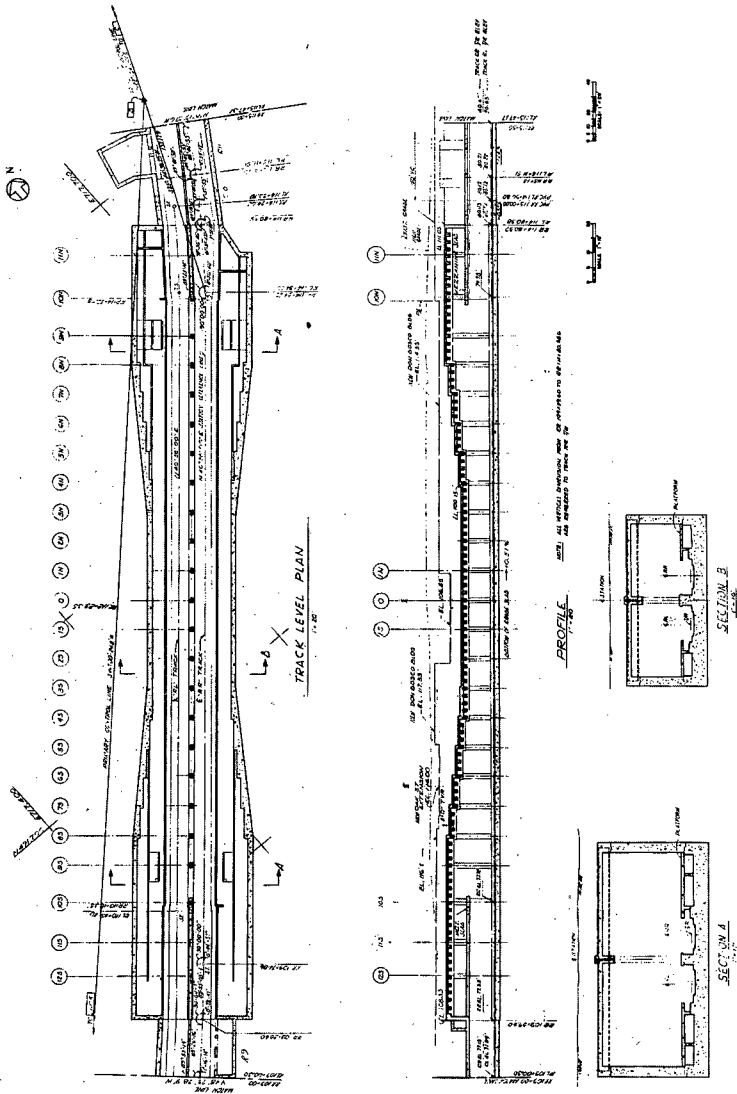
The station structure will be constructed by cut-and-cover methods and will be of reinforced-concrete except for the roof which will be a composite ceiling system. The more than usual volume of space at each end of the platforms will aid in minimizing the piston effect associated with trains as they enter a station from a tunnel.
